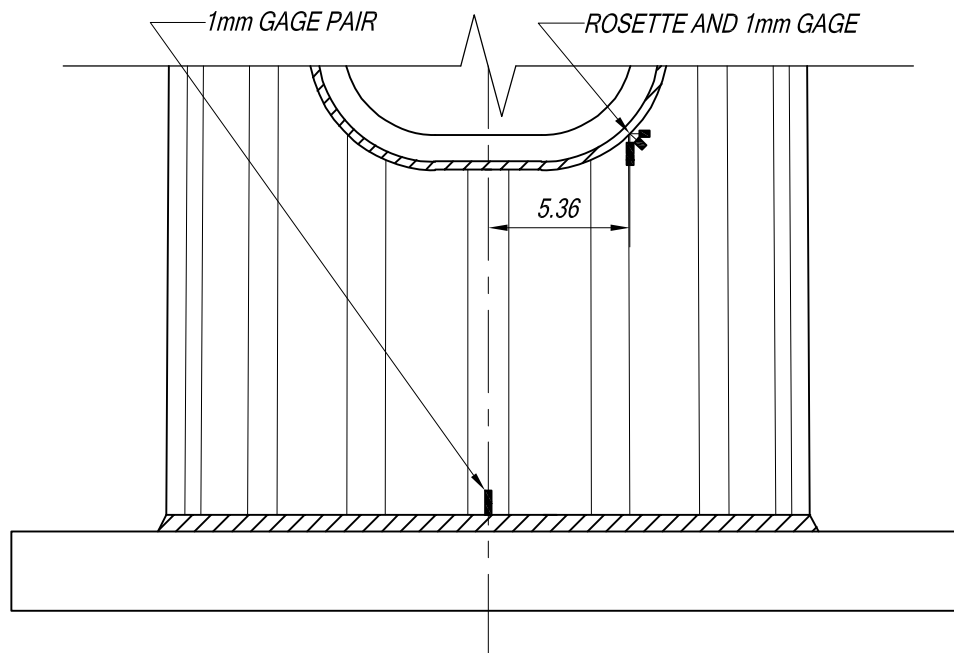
Type XI specimen elaborately instrumented specimen strain gaging plan, handhole side
